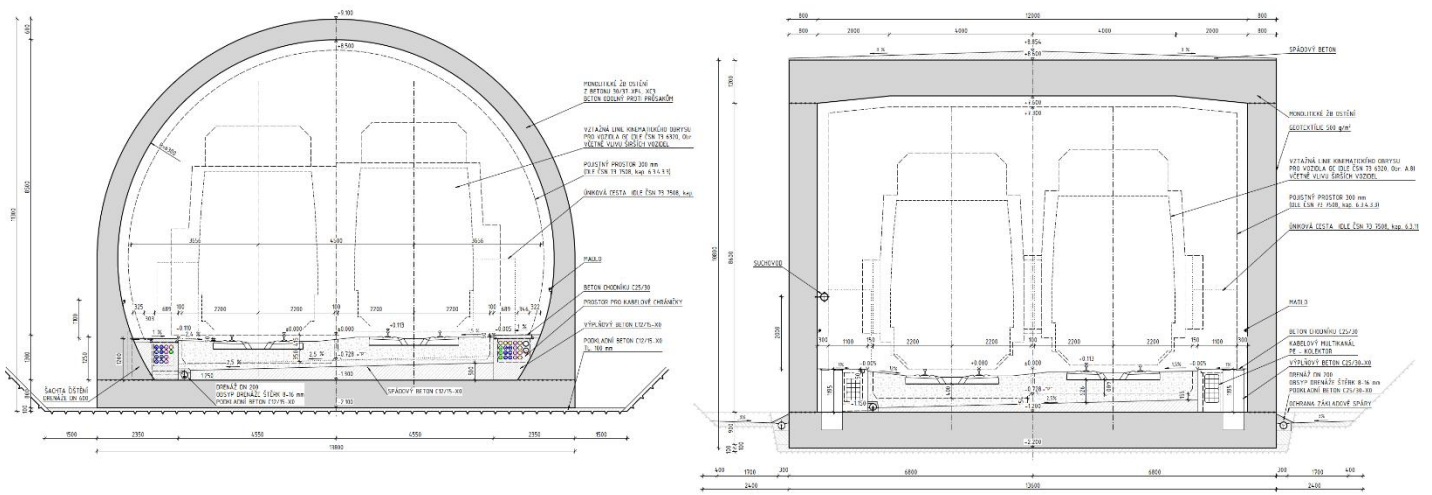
Left - Typical cross-section of the new solution, Right - Typical cross-section of the original solution
